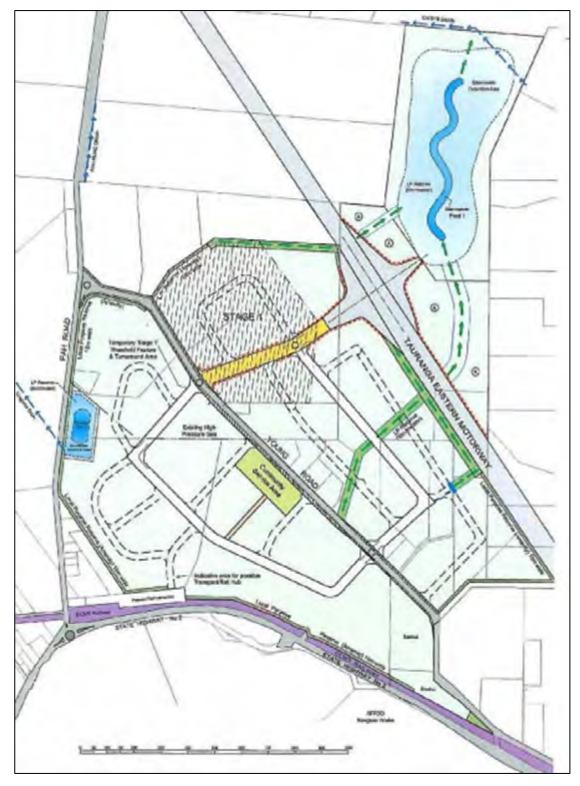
Rangiuru Business Park Structure Plan (WBOPDC District Plan)
